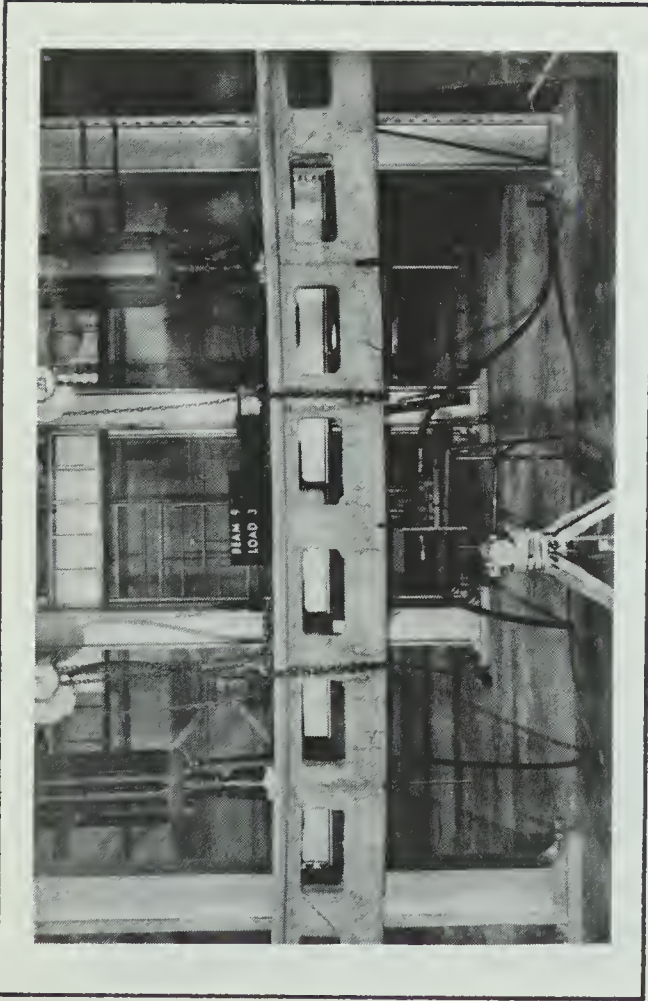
BEAM #4 CRACKING AND FAILURE PATTERNS
